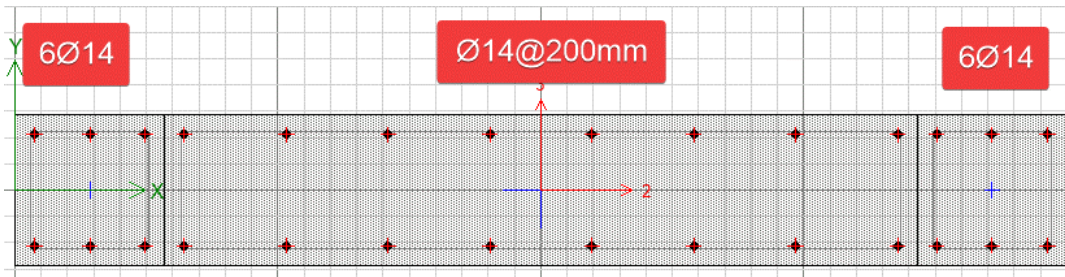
P1 (S3-S4) shear wall section reinforcement.
